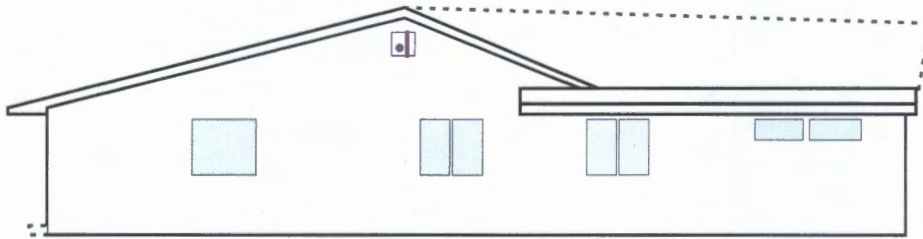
Elevation view existing house viewed from inside from east looking west. Southern most window (to the left in the diagram) is in the addition. New roof line (solid line) runs from the roof peak to the south. Old north roof line (dotted) is in the middle of the occupied (non-carport) north part of existing house.
